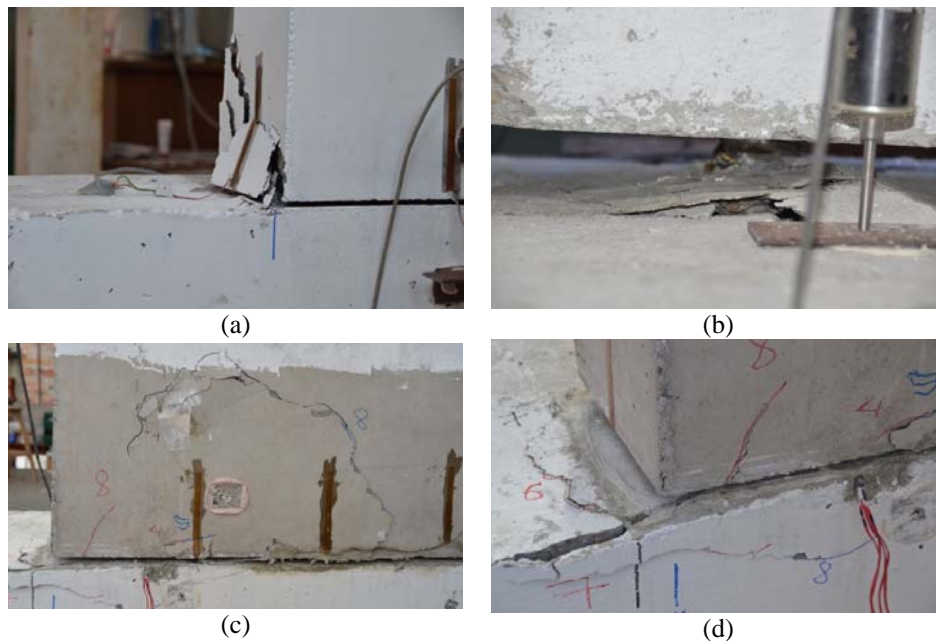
Observed damage at the end of the tests: (a) spalling of the concrete at the side face of the panel; (b) spalling of the concrete at the top of the beam around the rebar; (c) spalling of the concrete of the panel around the connection; (d) spalling of the concrete of the beam close to the connection.
